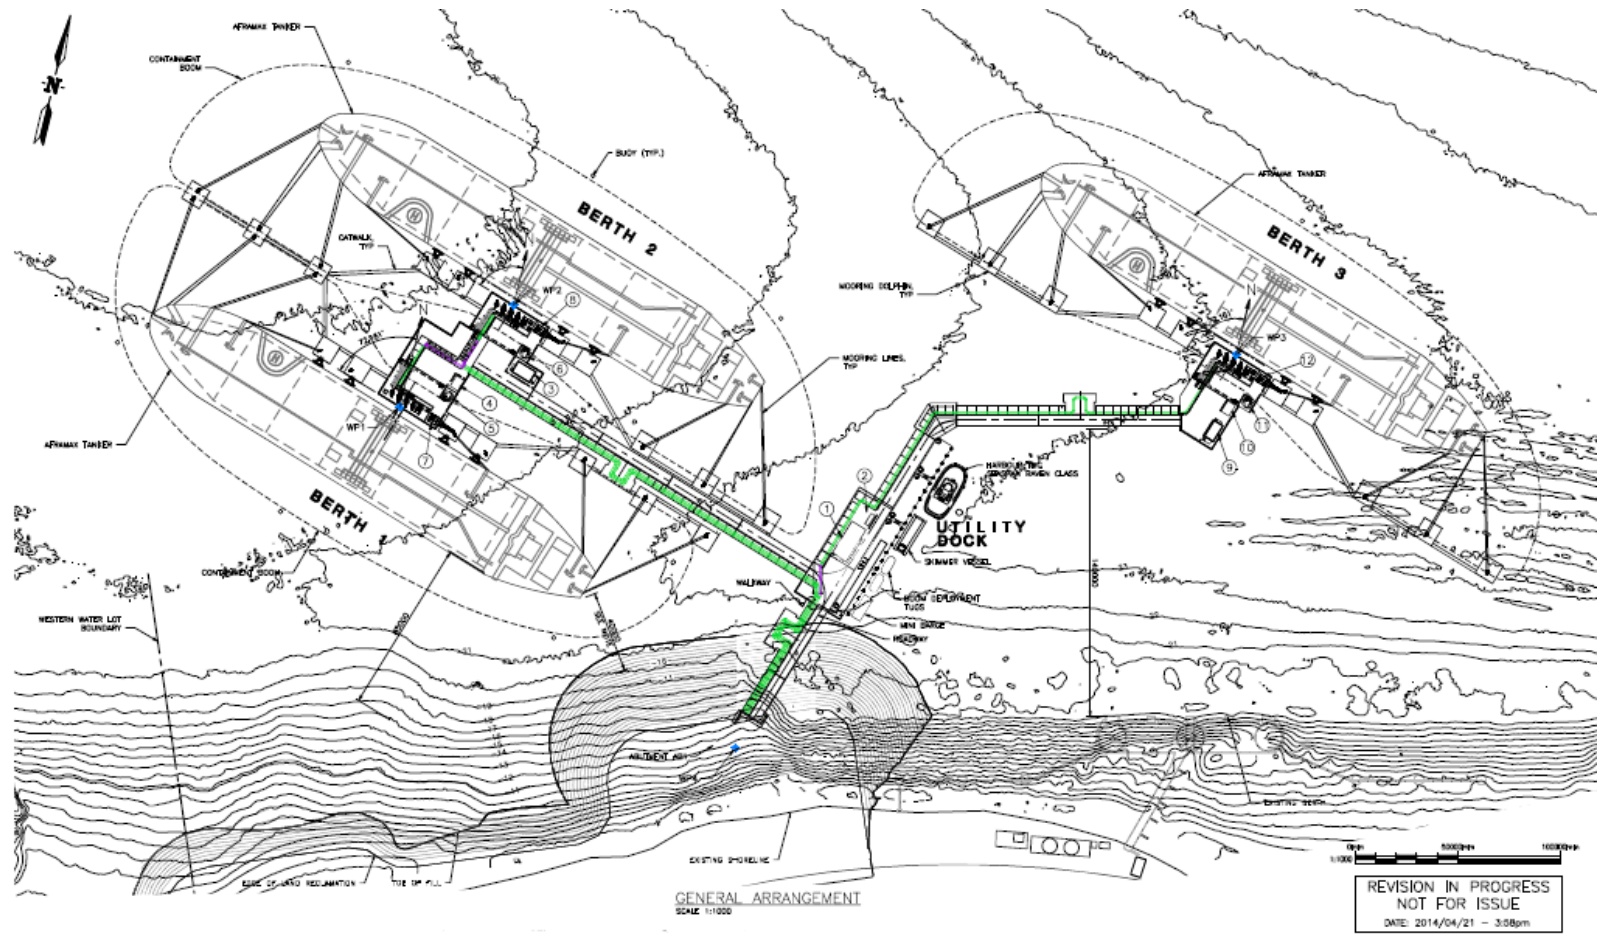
General Arrangement Plan for the Proposed Westridge Facilities
